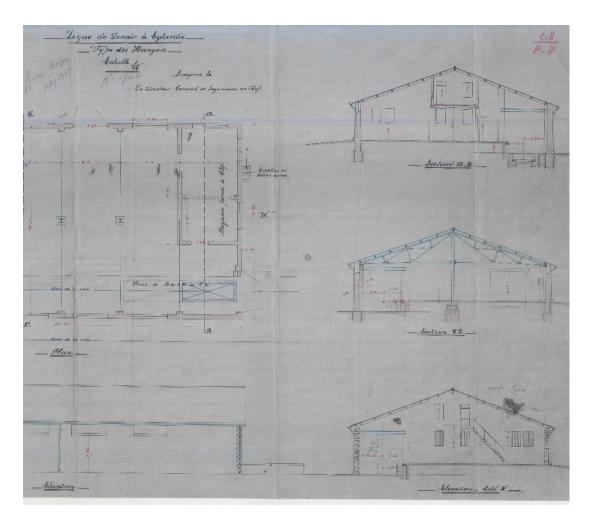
Original Drawings of Warehouse Building (TCDD Archive)
